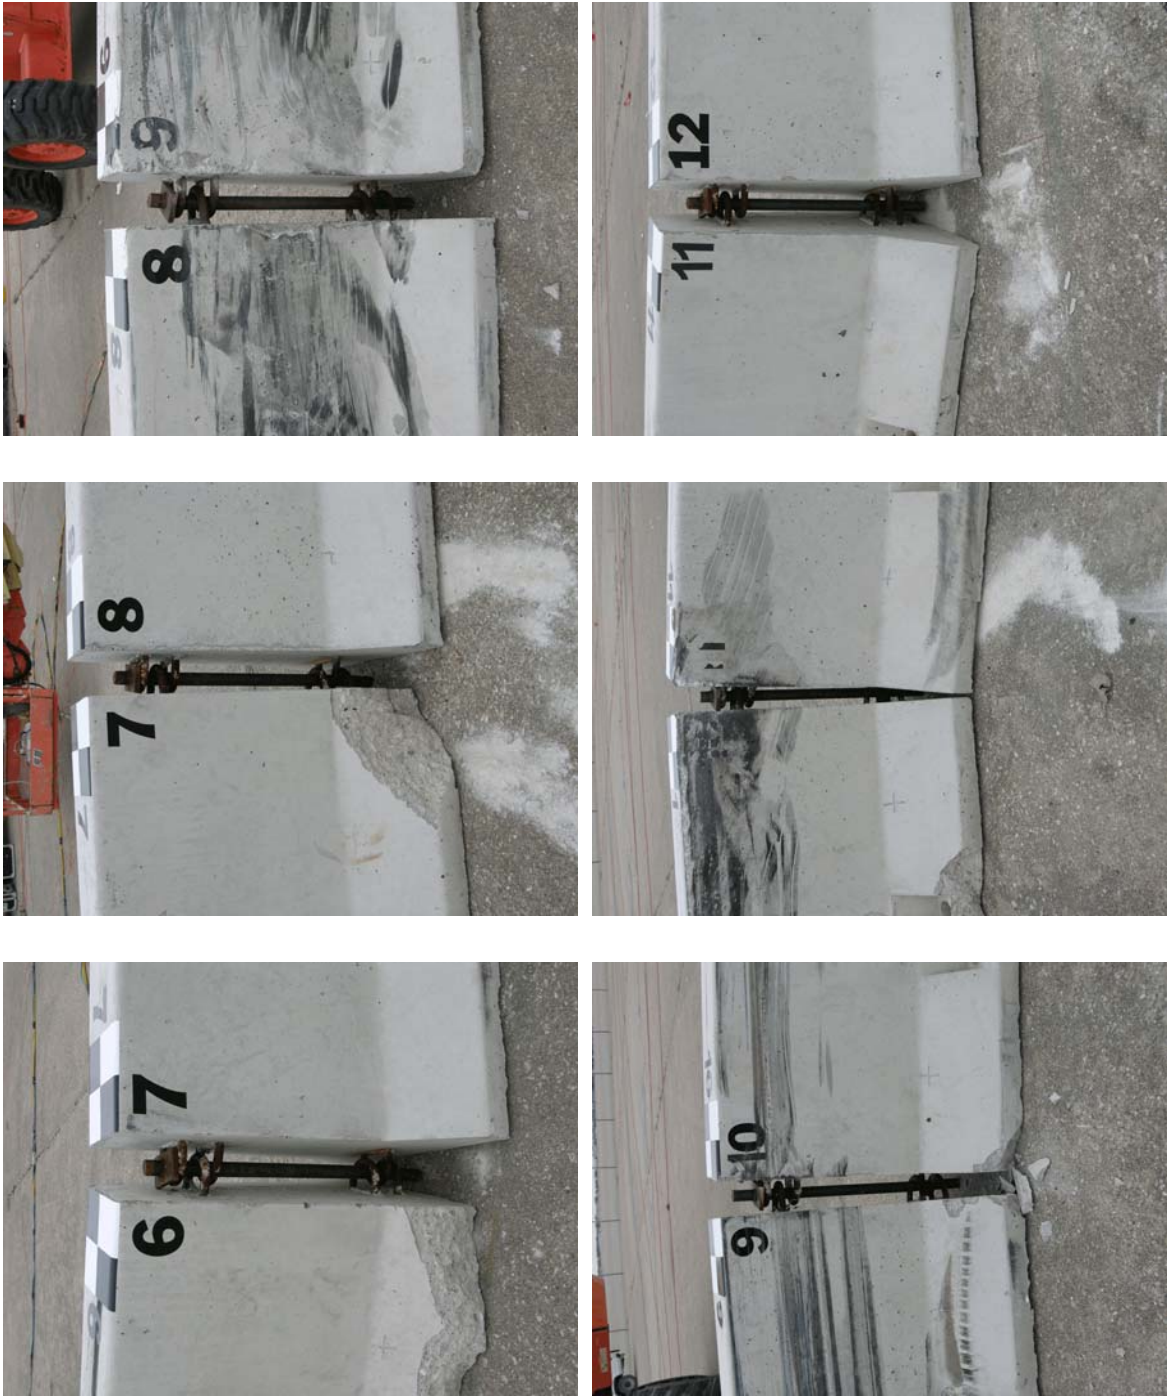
Temporary Barrier Damage, Test 2214TB-2
